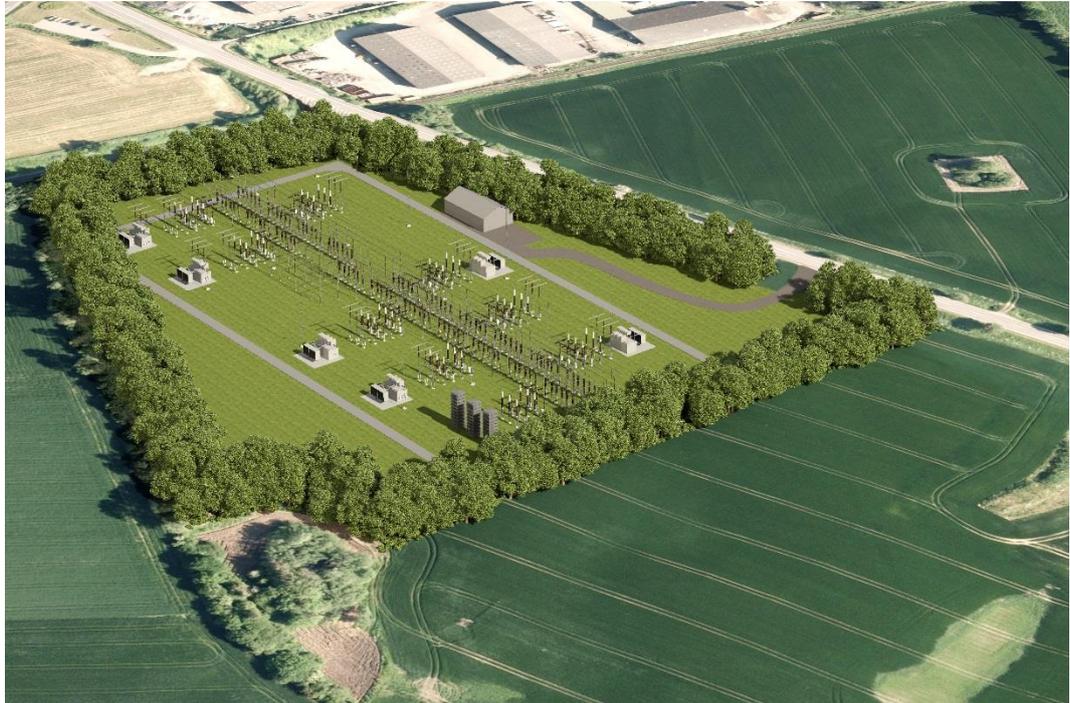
Visualisation of what a new substation Tolstrup Gårde might look like.
